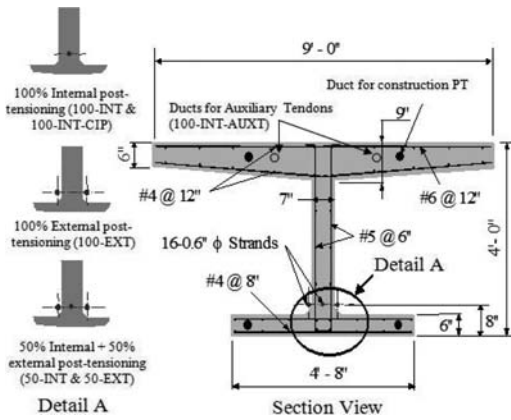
Test unit cross-section and reinforcement/post-tensioning layout.
